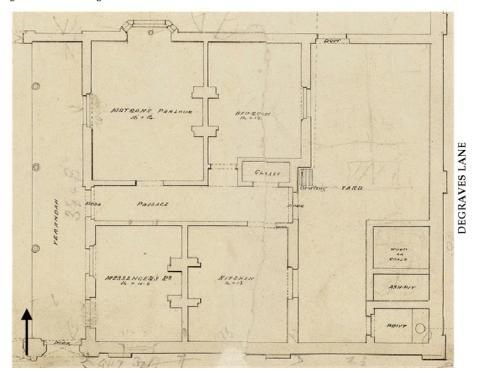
Plan of the Matron's Quarters building dated 1849. The original four room layout is shown with a walled yard to Degraves Lane (extract from Plan PWD 2661398, Tasmanian Archives and Heritage Office).
